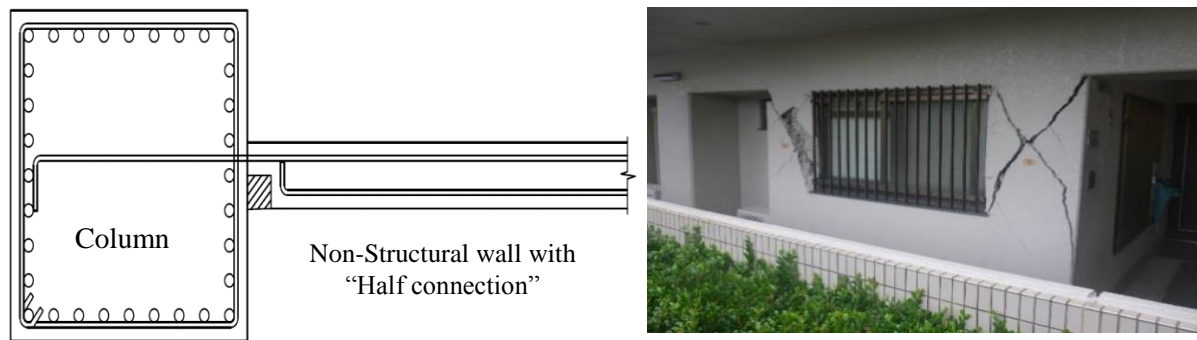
Typical Non-structural wall connection and example of damage to “non-structural” wall.
